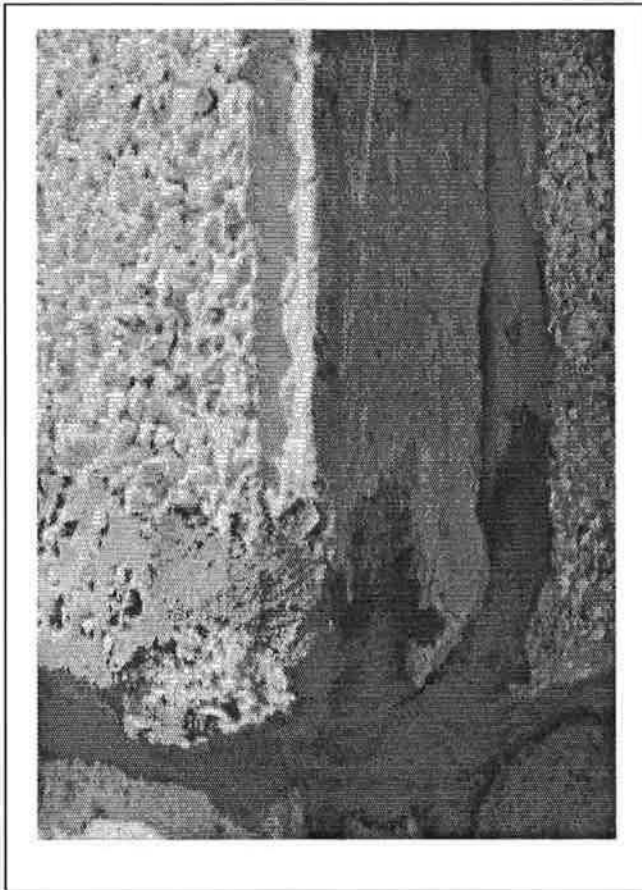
Exterior of an apartment building under construction showing panel joints before grouting.
